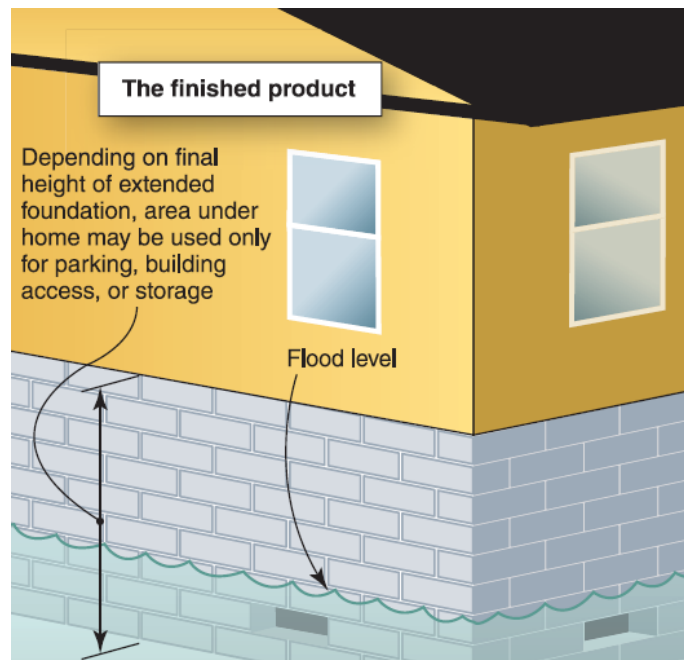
Openings are sometimes left in the foundation wall to allow water to flow through the wall, lowering the lateral pressure experienced by the wall (FEMA)
